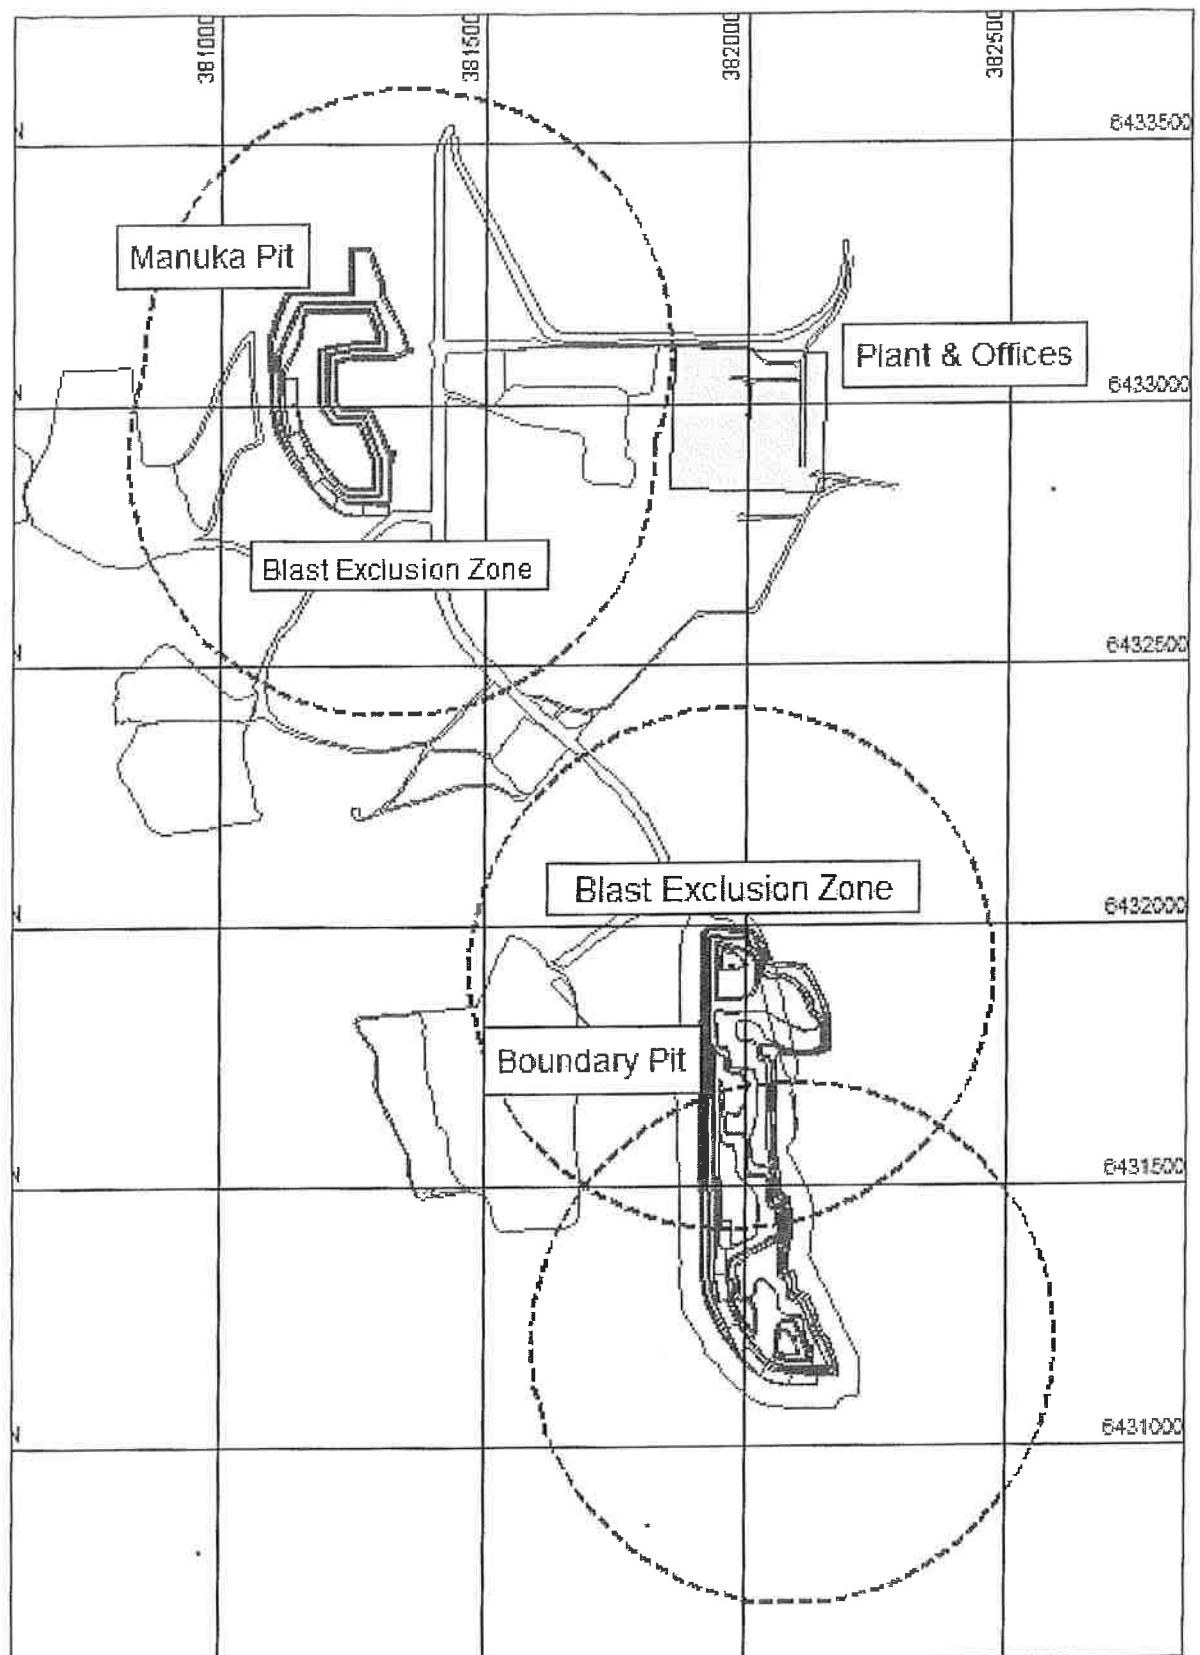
Plan showing proposed blast exclusion zones and location of plant and office infrastructure.
